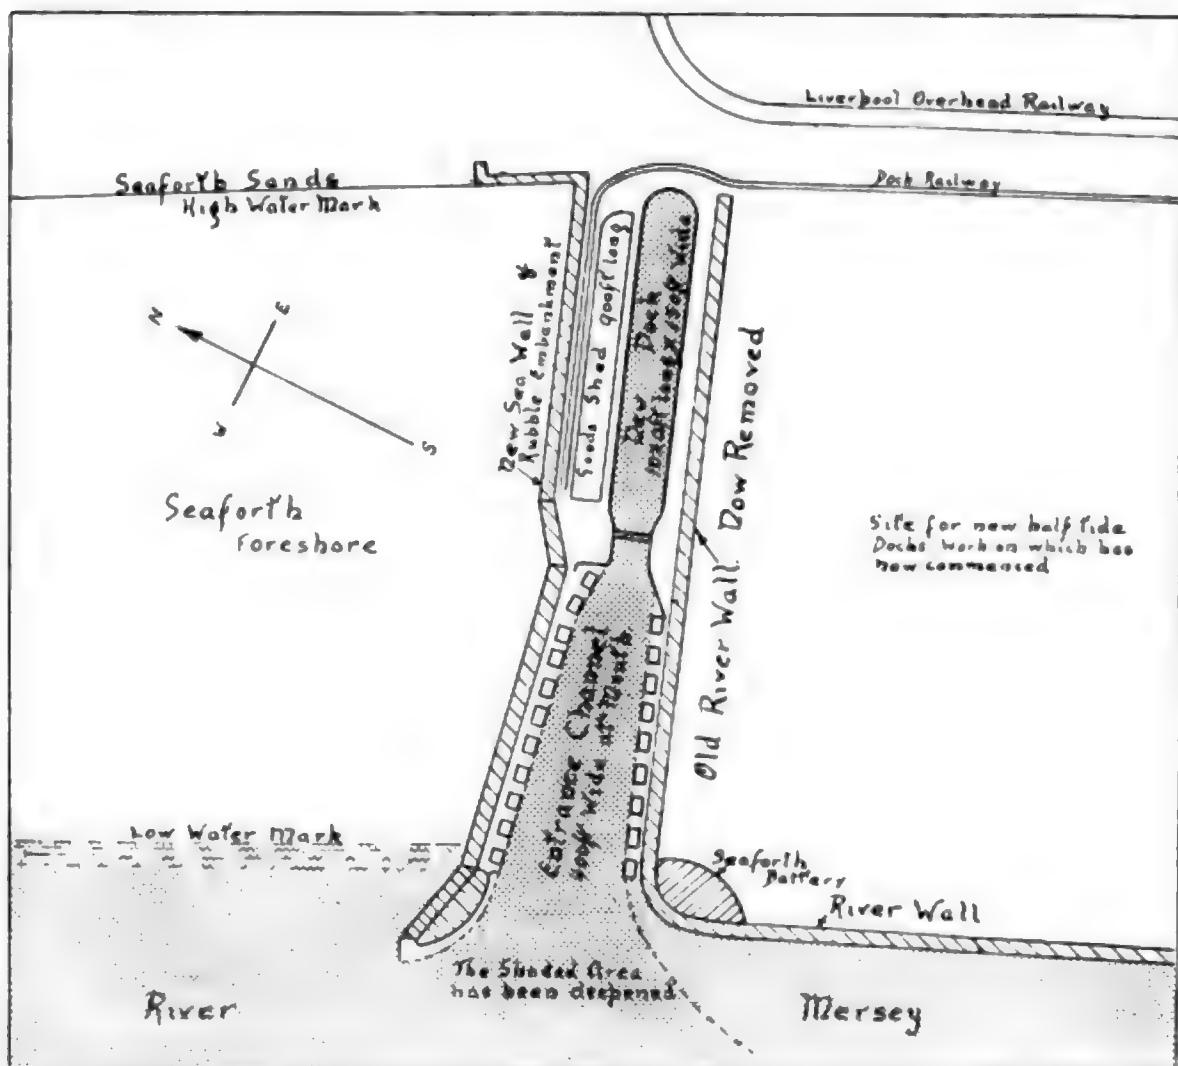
PLAN OF NEW GLADSTONE LOADING AND GRAVING DOCK.
